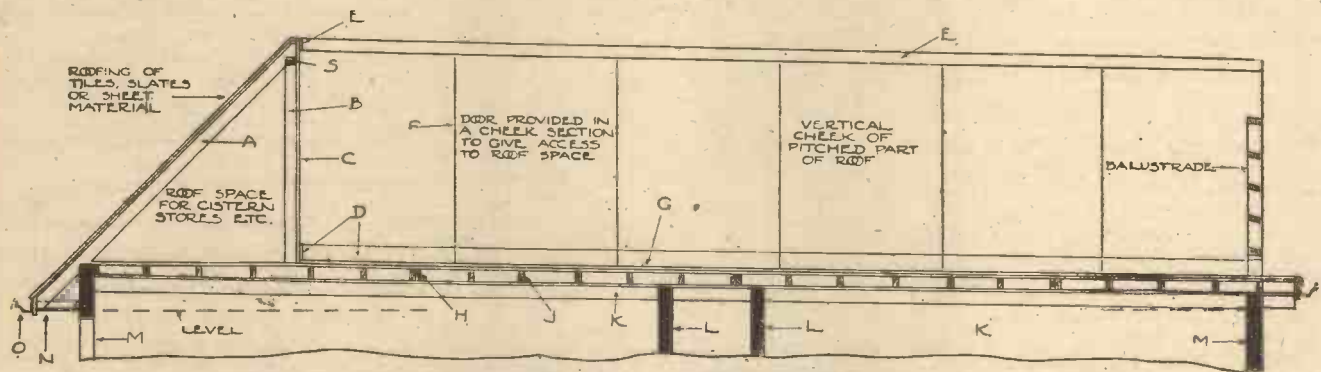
COMBINED PITCHED AND FLAT ROOF: SECTION FROM FRONT TO BACK EXTERNAL WALLS
